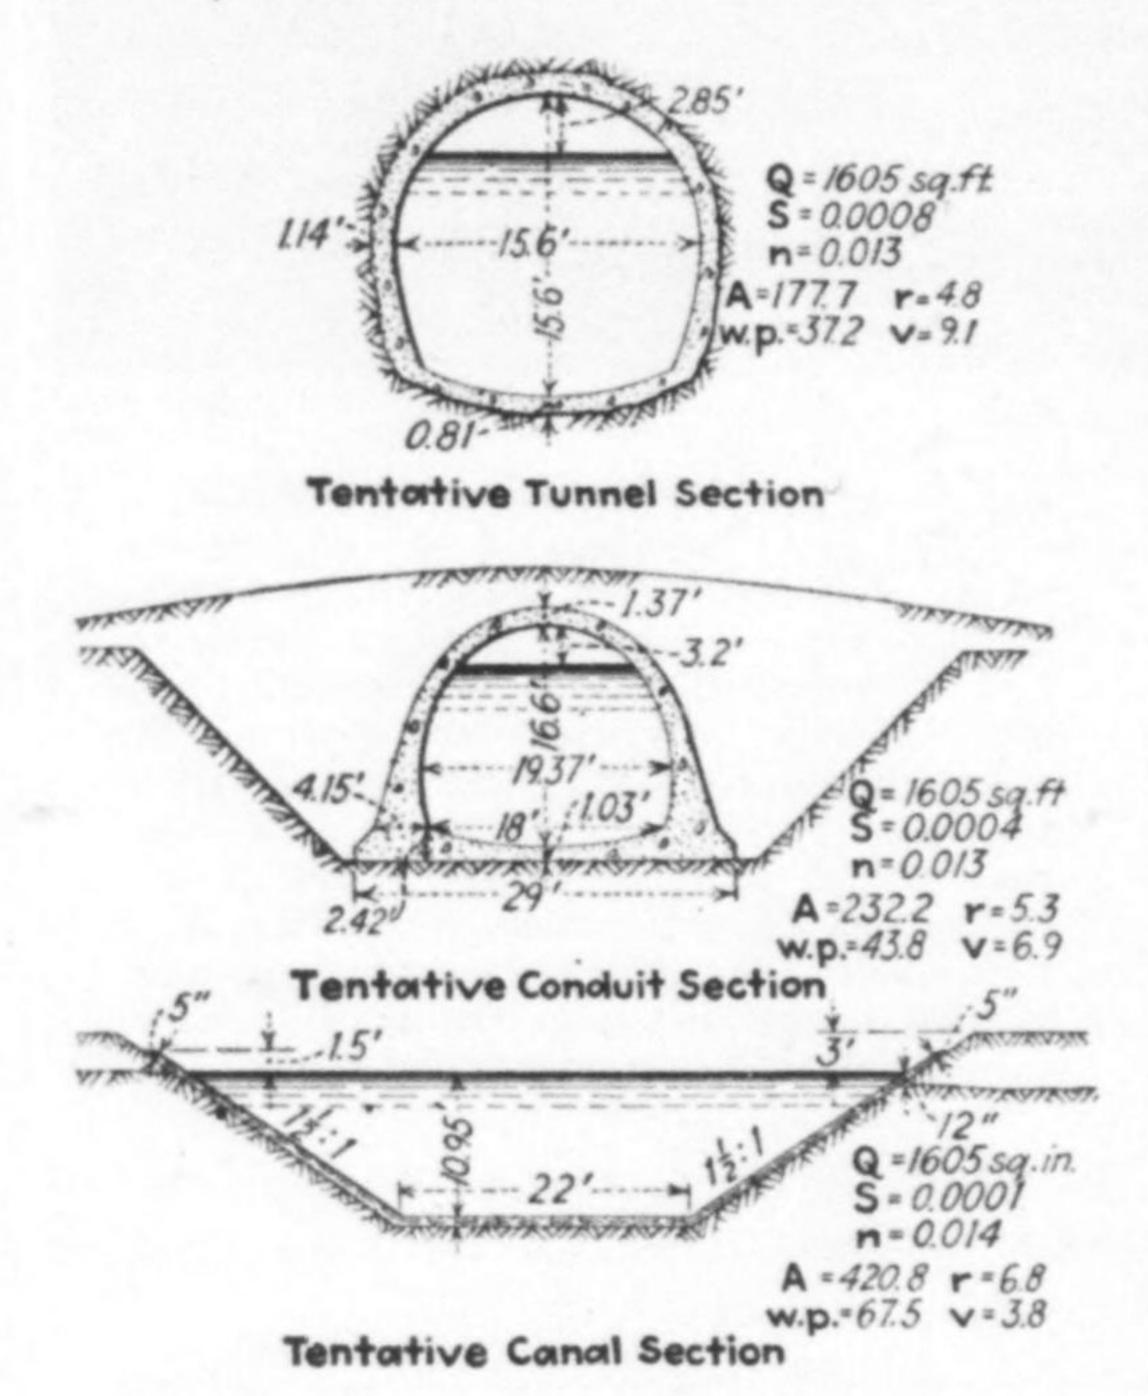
The aqueduct will be made up chiefly of open canal, closed conduit or tunnel of sections shown here.
